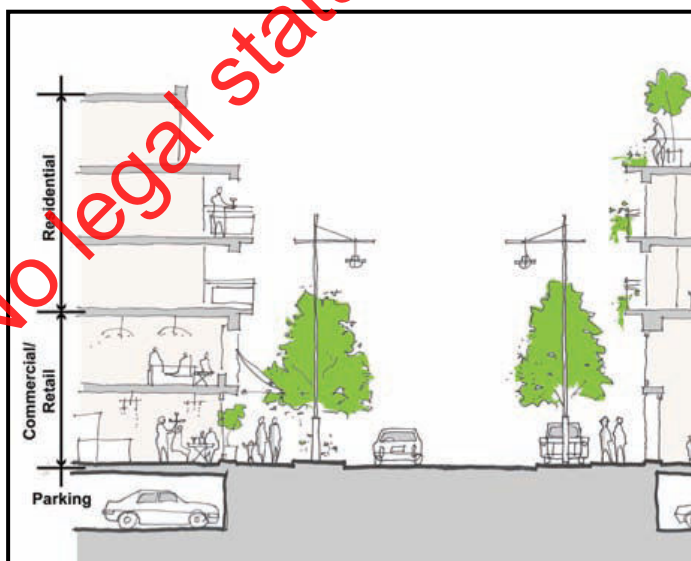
shows a mixed use proposal which places apartments at second floor above an active street of shops and cafes. First floor offices provide a 'buffer' to the noisier restaurant uses. A set back at second floor level gives further privacy and outside private space. This improves the compatibility of neighbouring uses and activities
